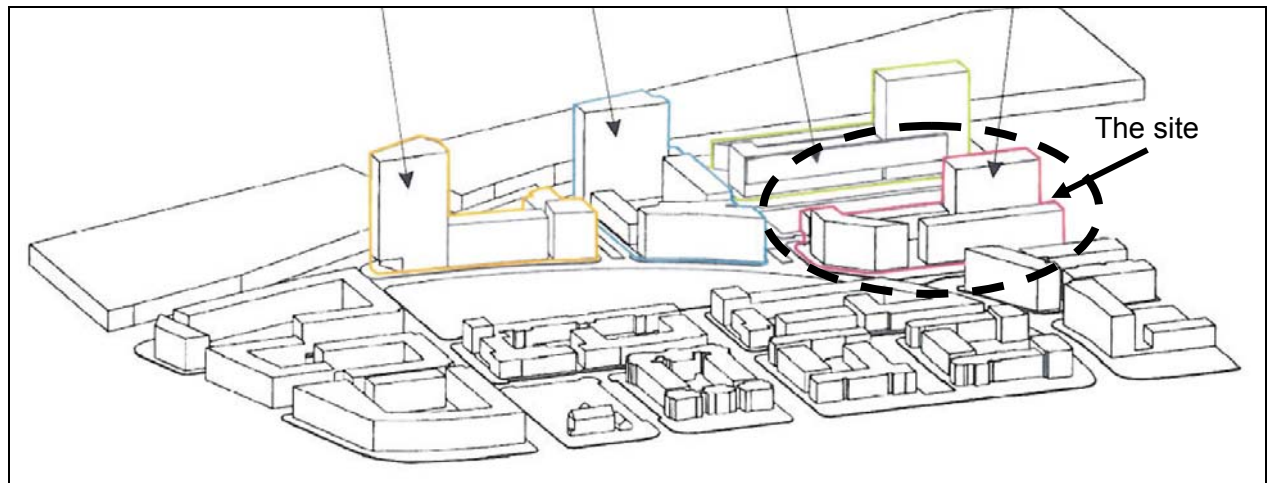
Built form envelopes from the Revised Victoria Park Masterplan (2003)
